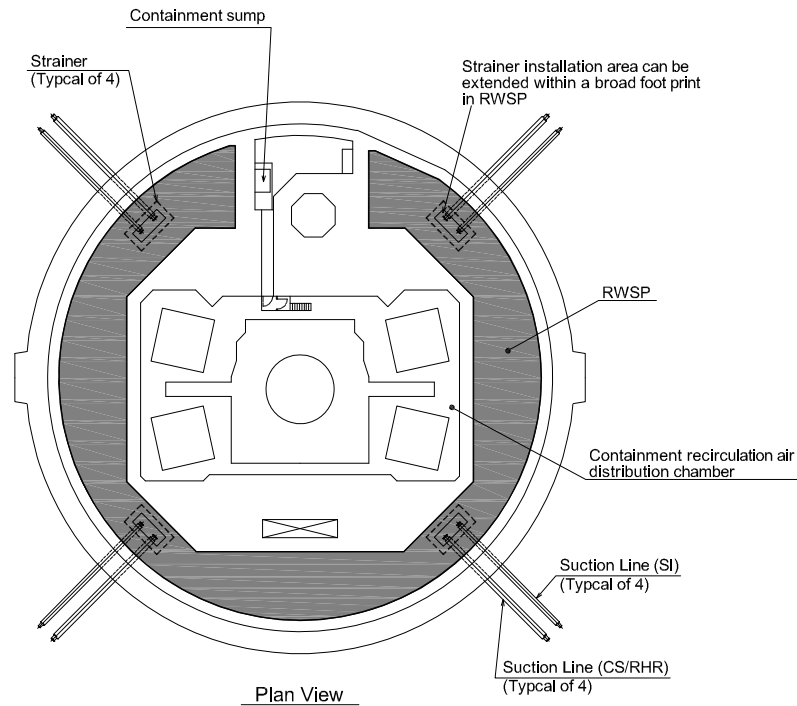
Plan View of RWSP and ECC/CS Strainers
